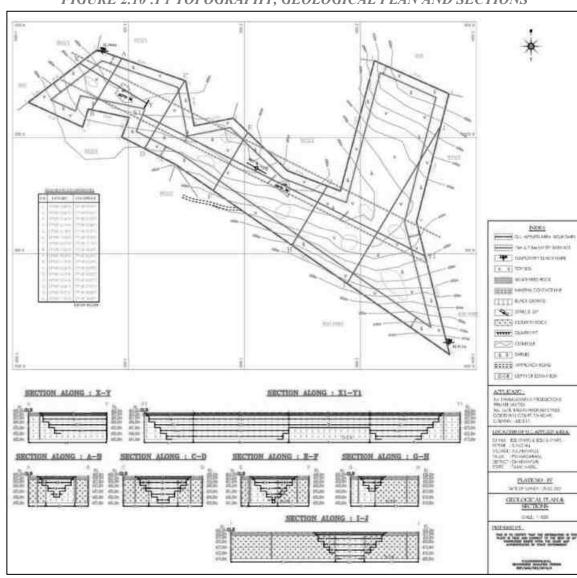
P1 TOPOGRAPHY, GEOLOGICAL PLAN AND SECTIONS
